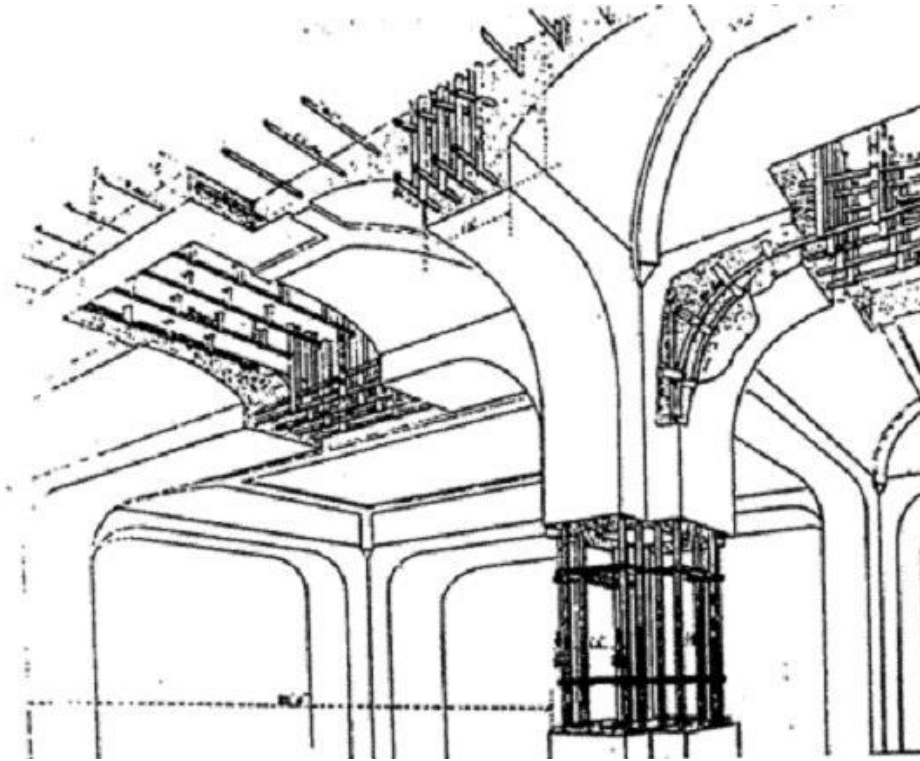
Image of Hennebique's Ferro-concrete Frame construction System
